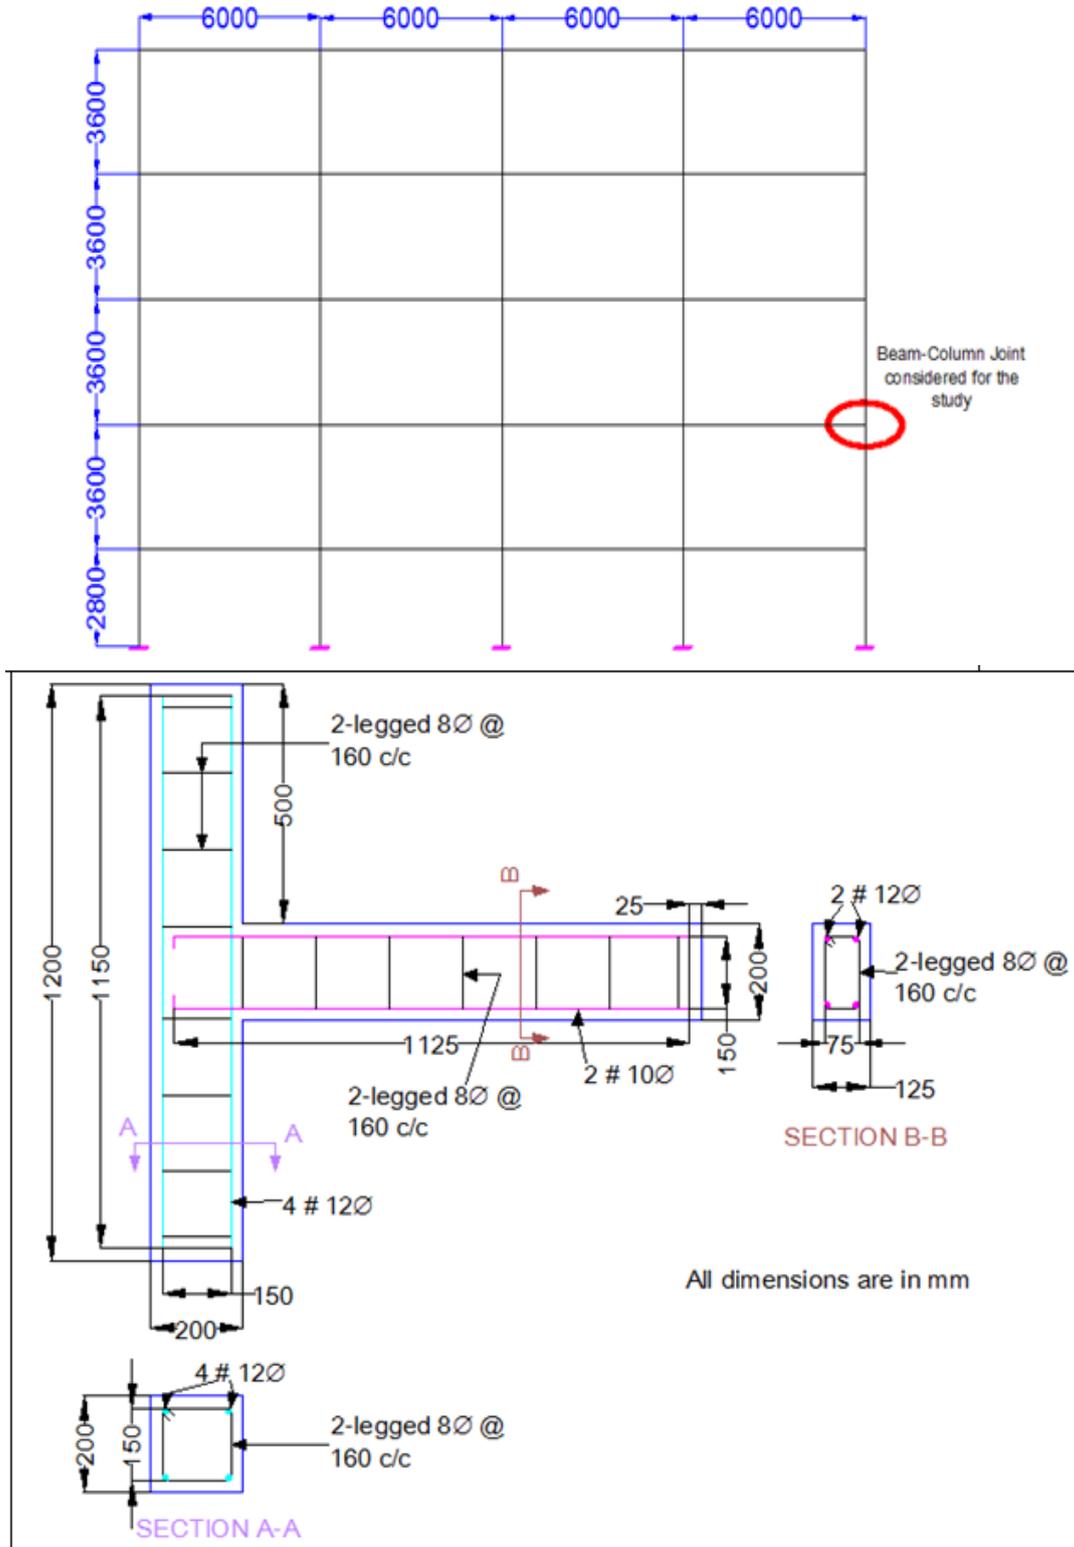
General Arrangement of the Building Frame Considered for the Study
